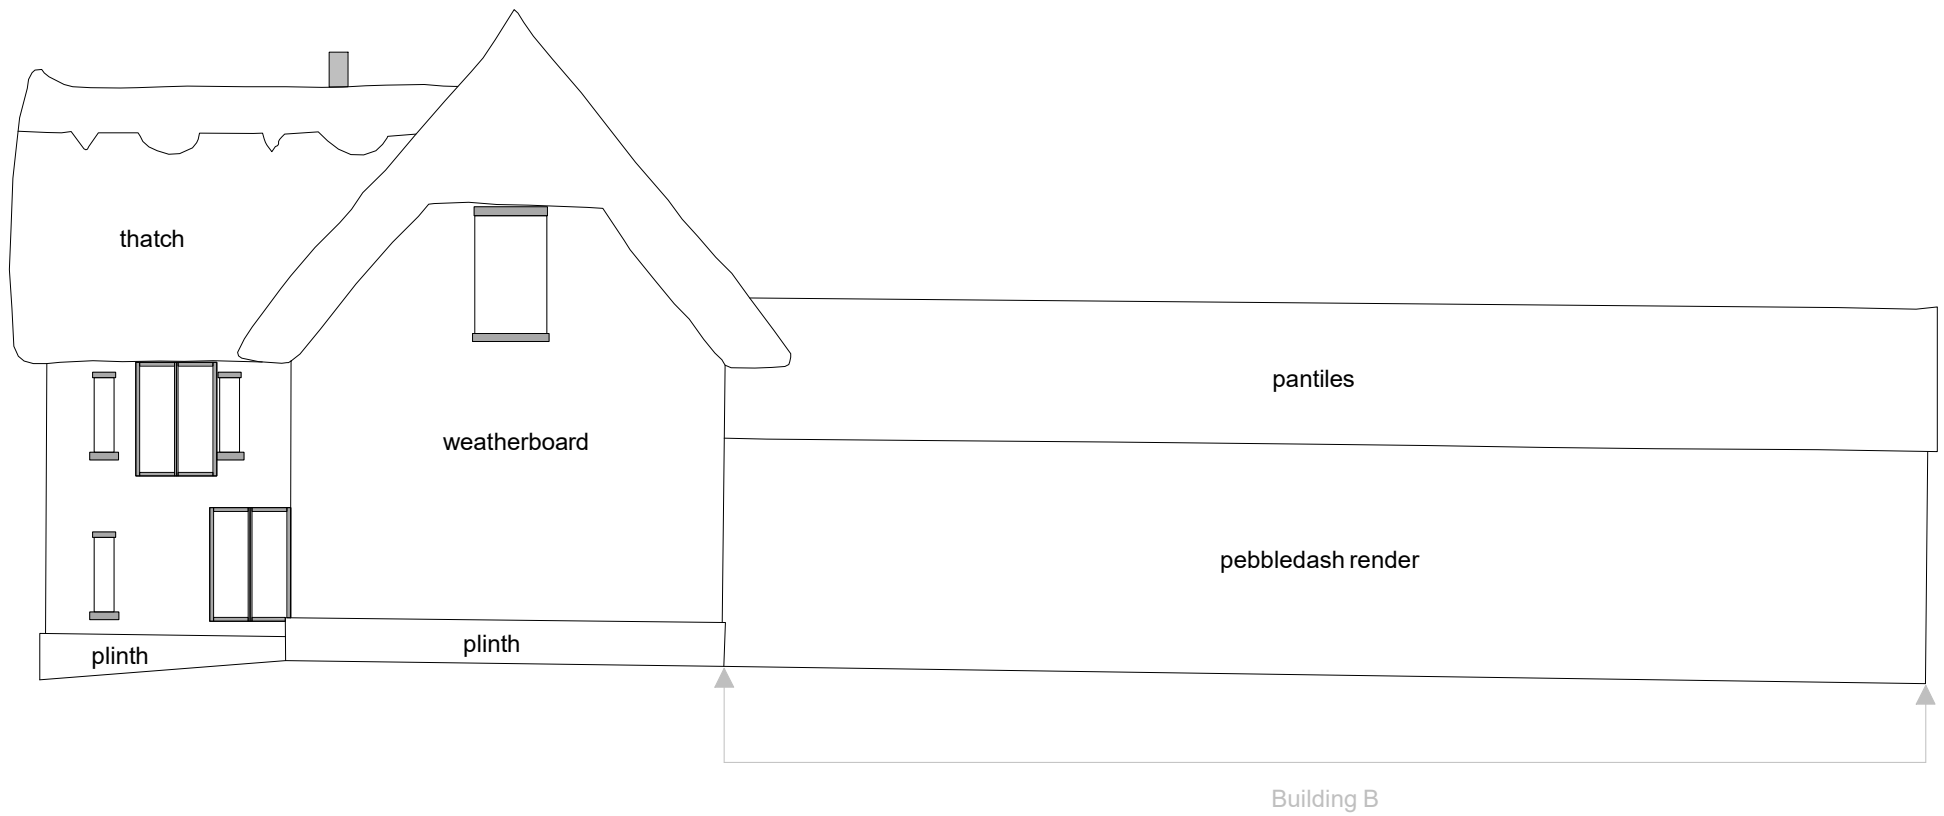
Eastern elevation of barn and Building B. Modern windows additions shown in grey.
